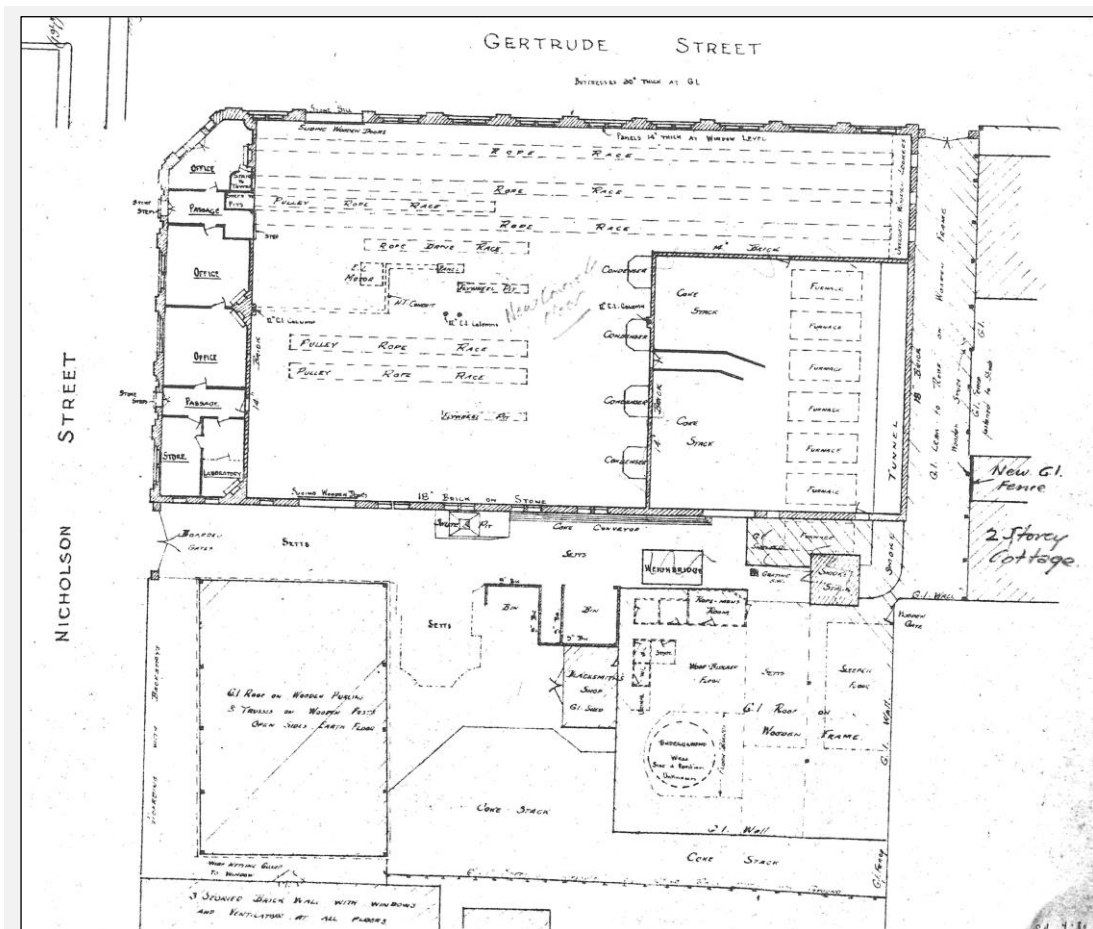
Plan of the Nicholson Street Cable Tram Engine House, c. 1938. Image source: Victorian Collections
